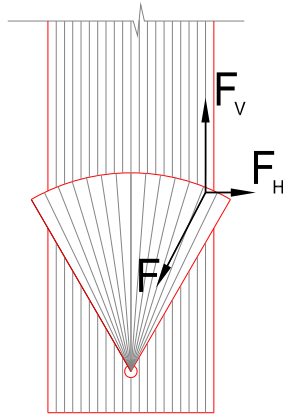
Rupture of the CFRP anchor near the anchor hole opening
